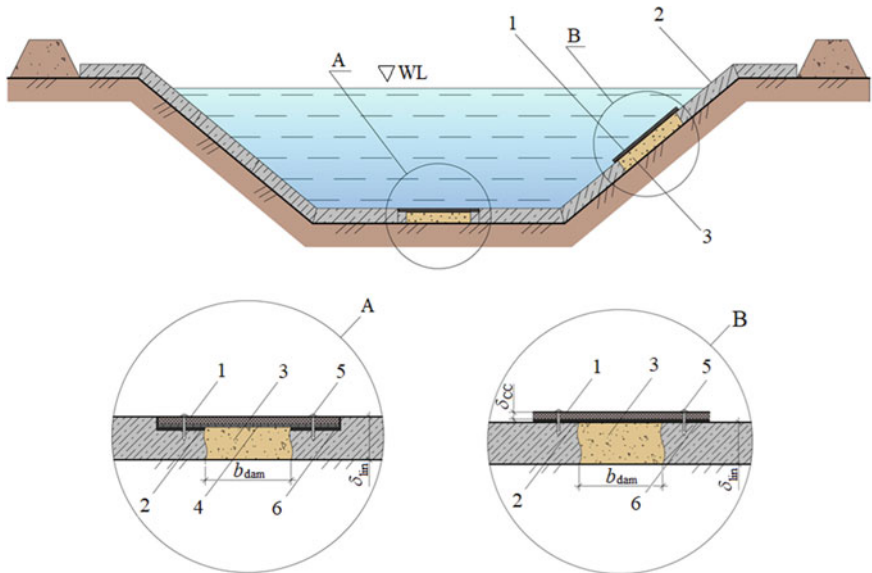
The method large damage to the concrete lining repairing along the bottom (node A) and on the slope (node B): δ_{lin} —lining thickness; b_{dam} —damage width; b_{CC} —concrete canvas thickness; 1—concrete canvas; 2—concrete lining; 3—backfill; 4—self-tapping screw; 5—a polymer sealant layer; 6—base
